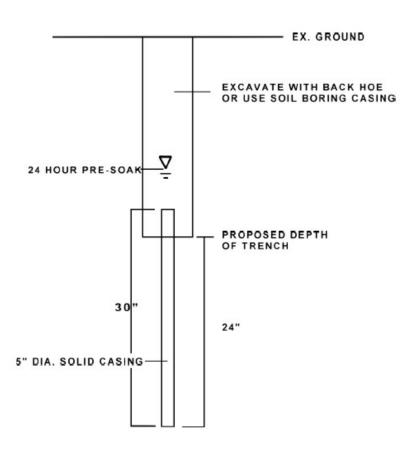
Infiltration Testing Requirements (MDE, 2002)
